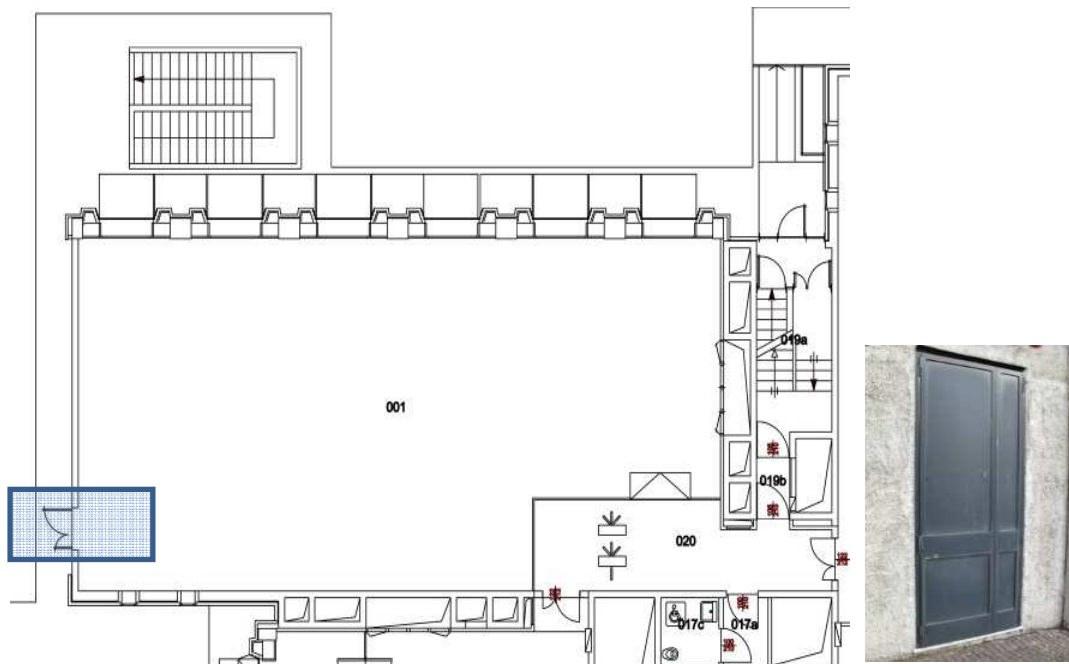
Stratigraphic analysis and identification on the drawing files. Ground floor: the detail of central part of the Façade (the concrete continuous wall), realized without any insulation panels and the front door
